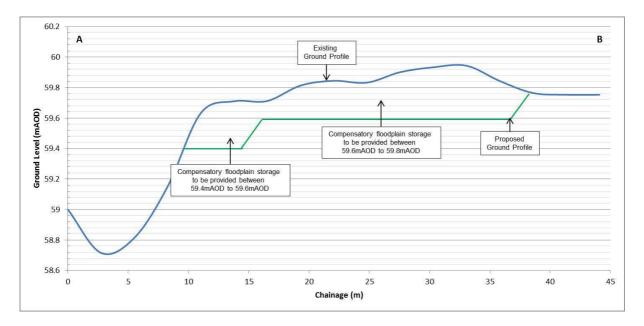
Lower Level Storage Indicative Cross Section (Set to Cross Sections Locations shown in Figure 15).
